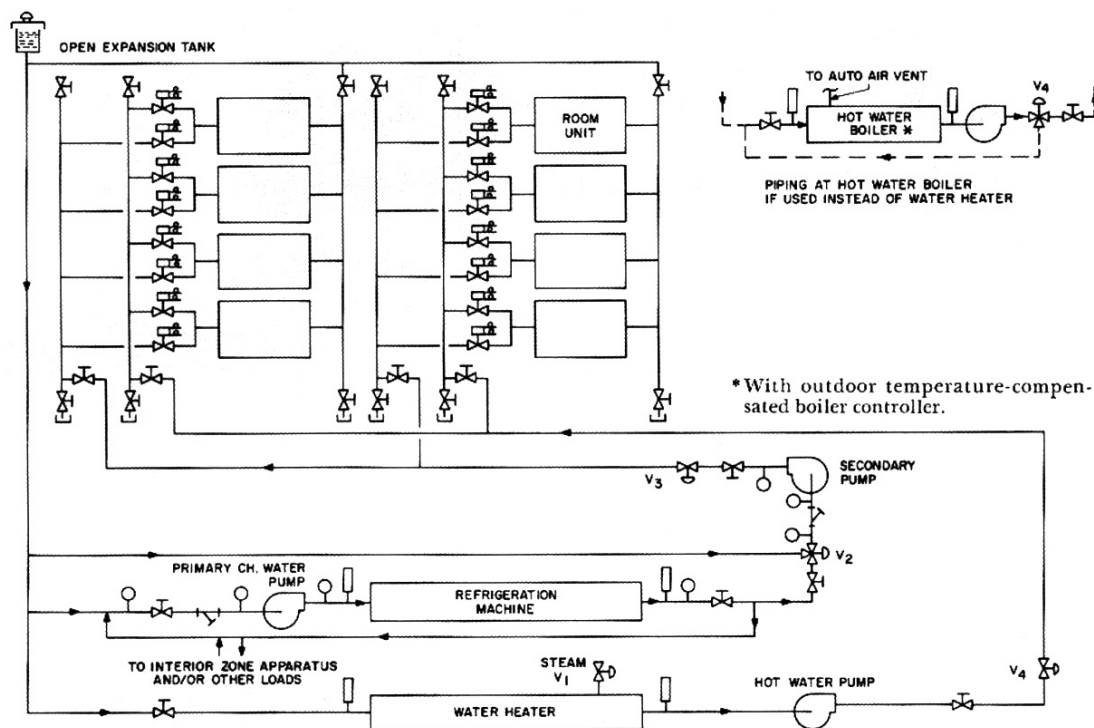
Schematic Water Piping, Three-Pipe Fan-Coil Unit System
